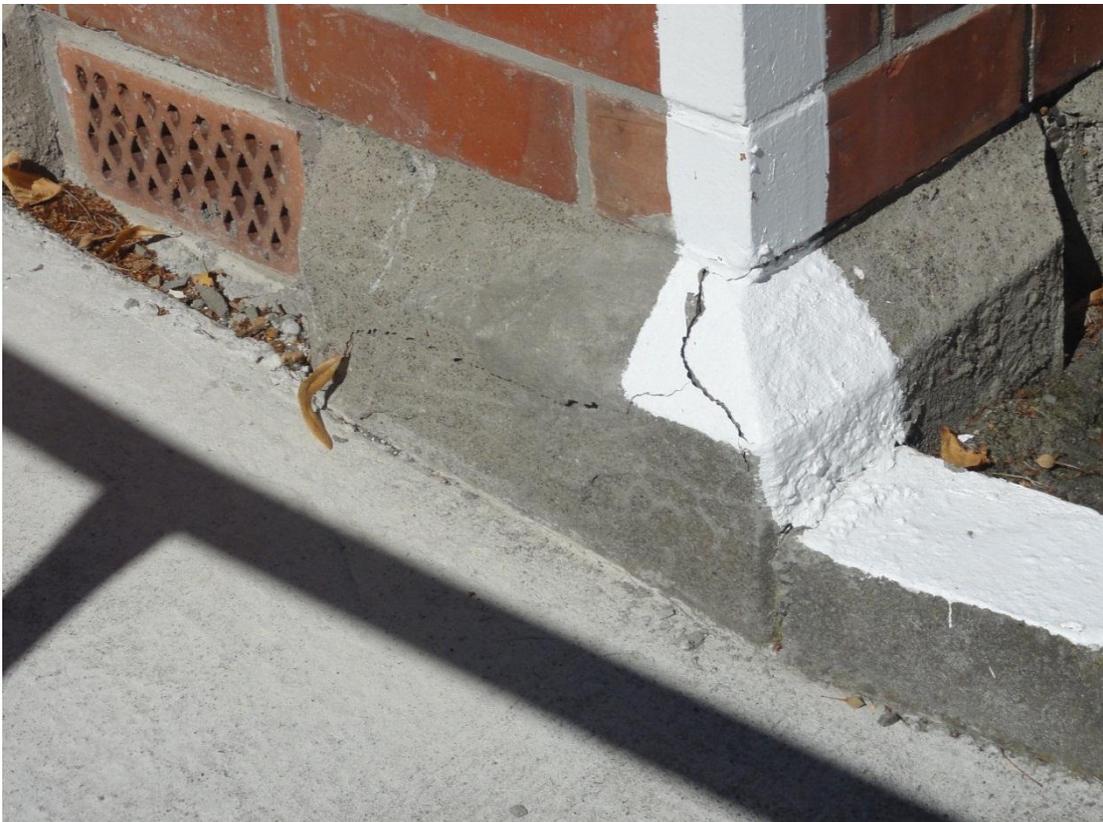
3mm wide cracking on the north west corner foundations.
